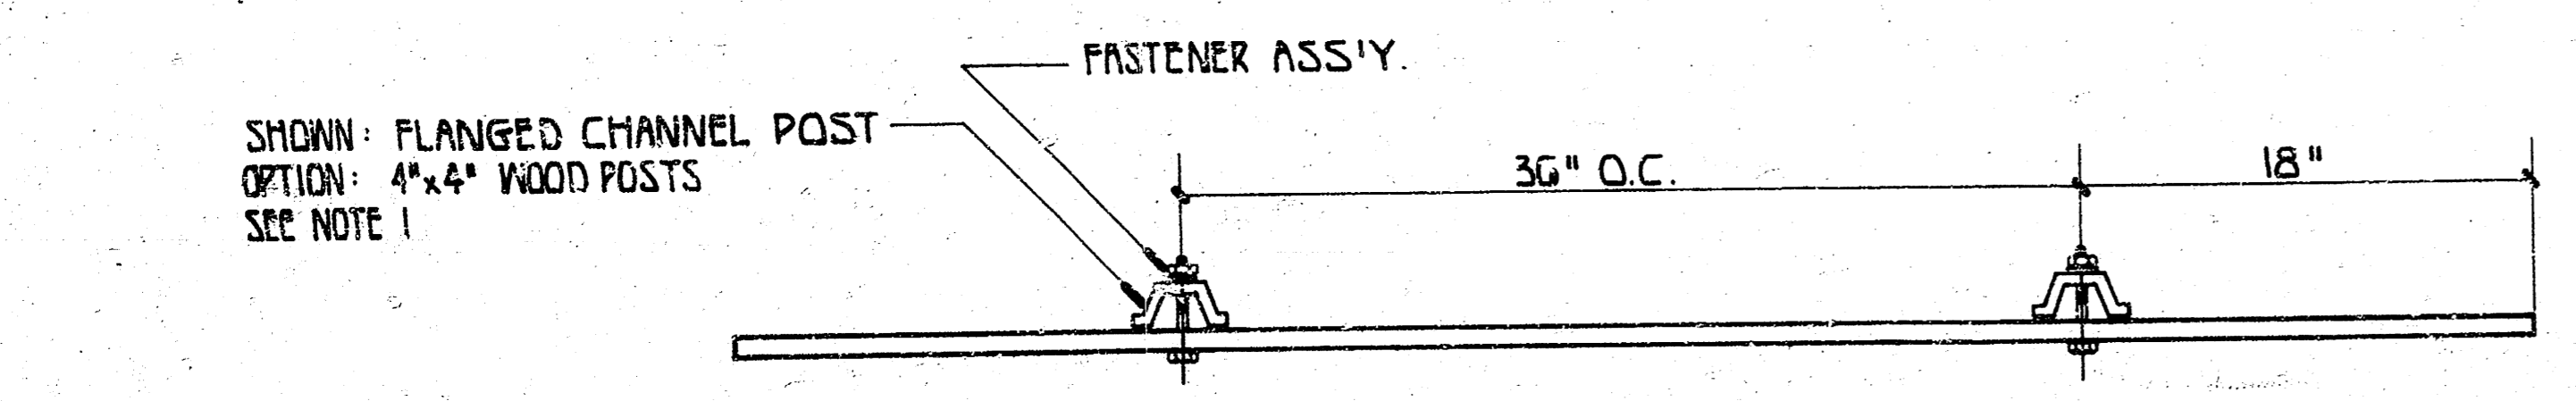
DETAIL B: PLYWOOD / 4x4 WOOD POSTS
